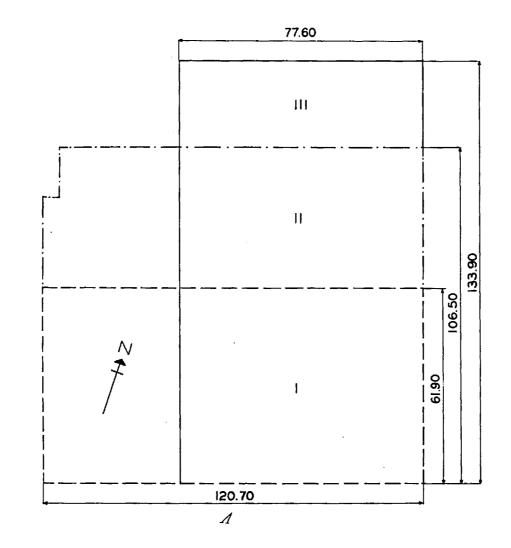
Reconstructed Plan of Final Treasury. Scale, 1:400
